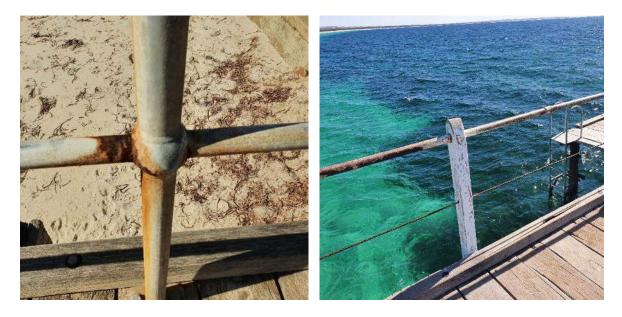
Typical Condition 4 Handrailing (Defect: Surface Corrosion)
